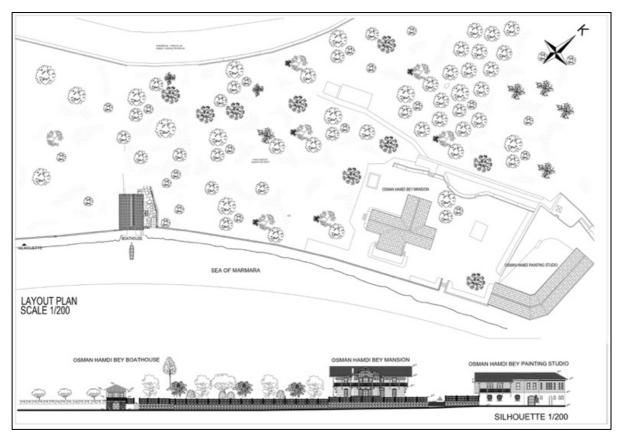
1/100 Restitution Site plan (Tanriverdi, 2011)
